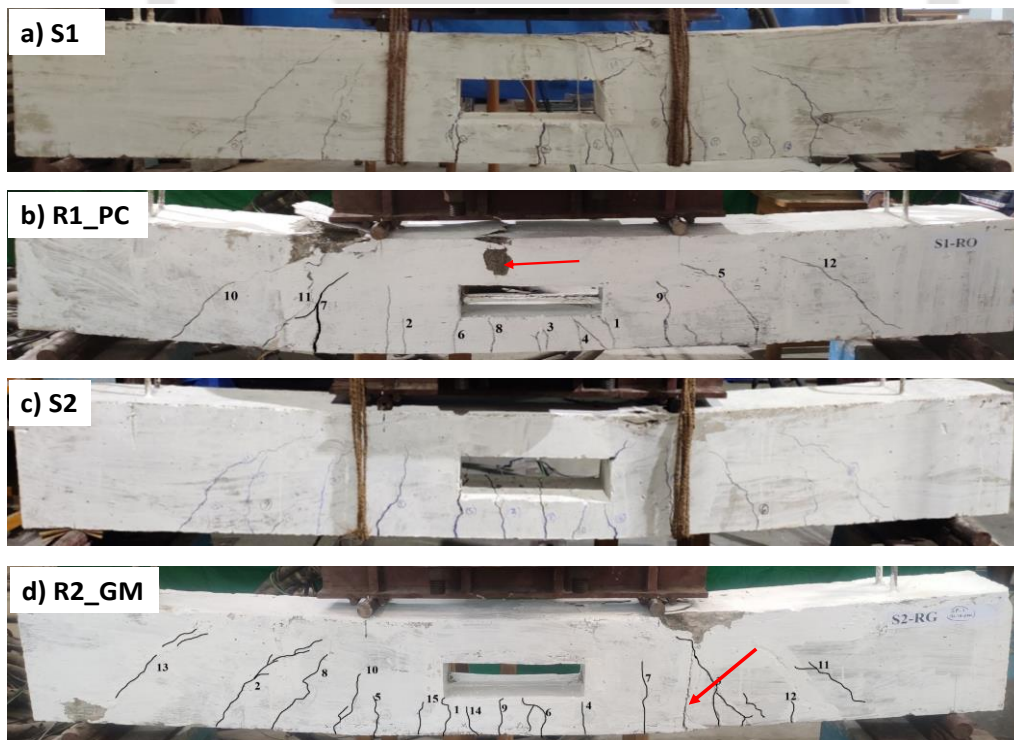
Crack pattern of controlled and repaired beam with mid-span opening (28th Day)
